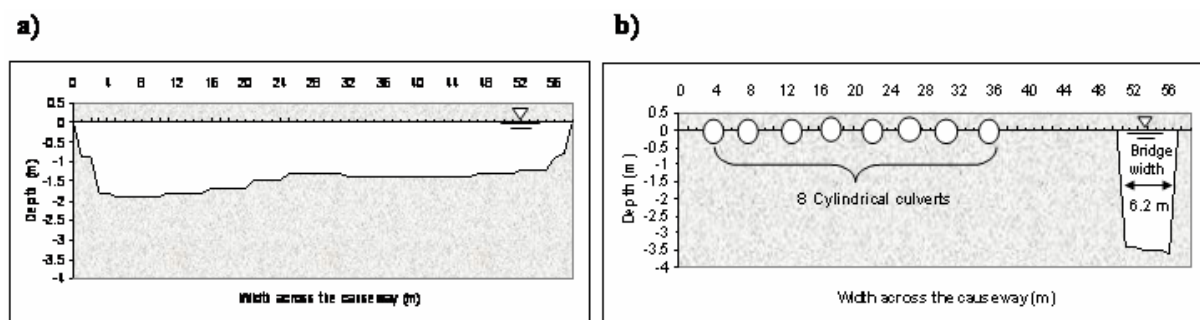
Schematic representation of a) channel cross section at the causeway before the construction of causeway (Before 1984); b) channel cross section at the causeway after the construction of causeway and the bridge (After 2005)
